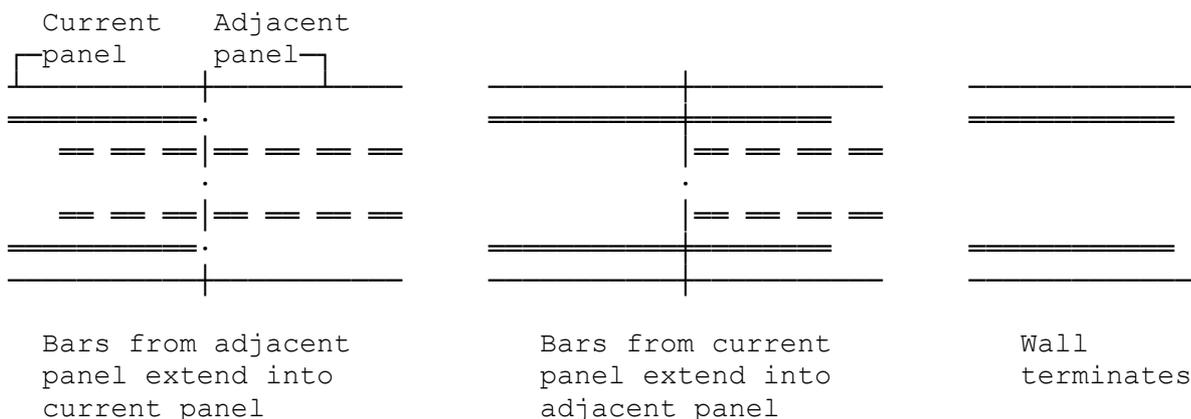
(b) - PLAN ON RIGHT HAND END OF WALL PANEL
